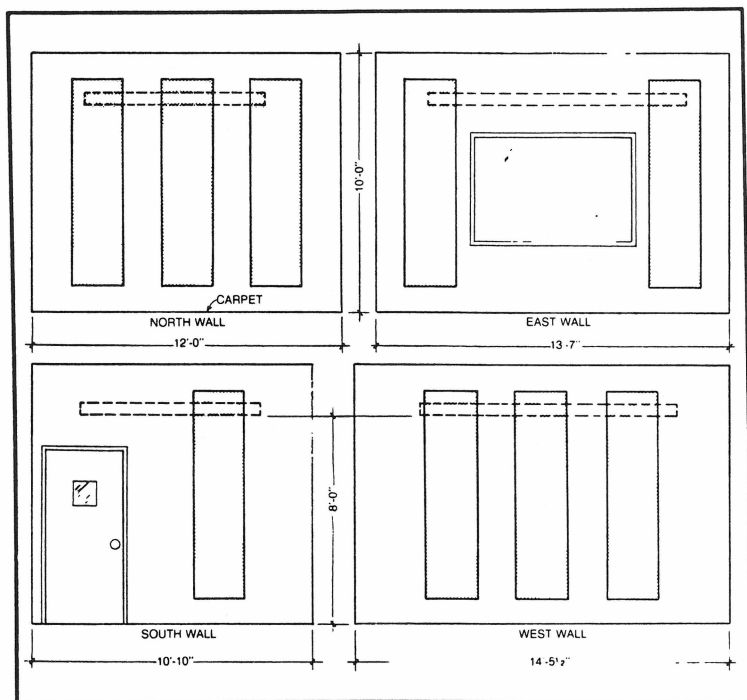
Wall elevations of Studio A showing placement of Vicracoustic panels. The broken lines indicate relative position of the suspended frame holding low peak absorbing boxes.
